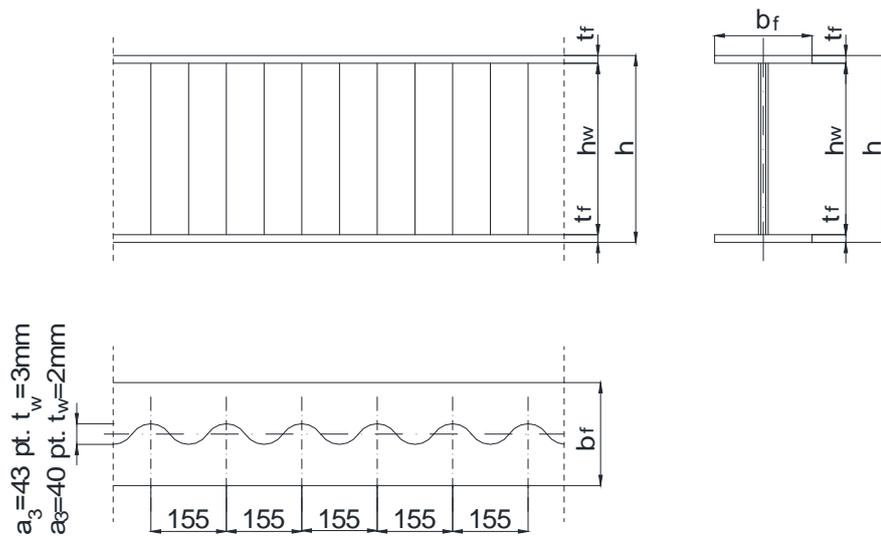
The dimensions for the sinusoidal shape webs used for automate manufactured SIN profiles
